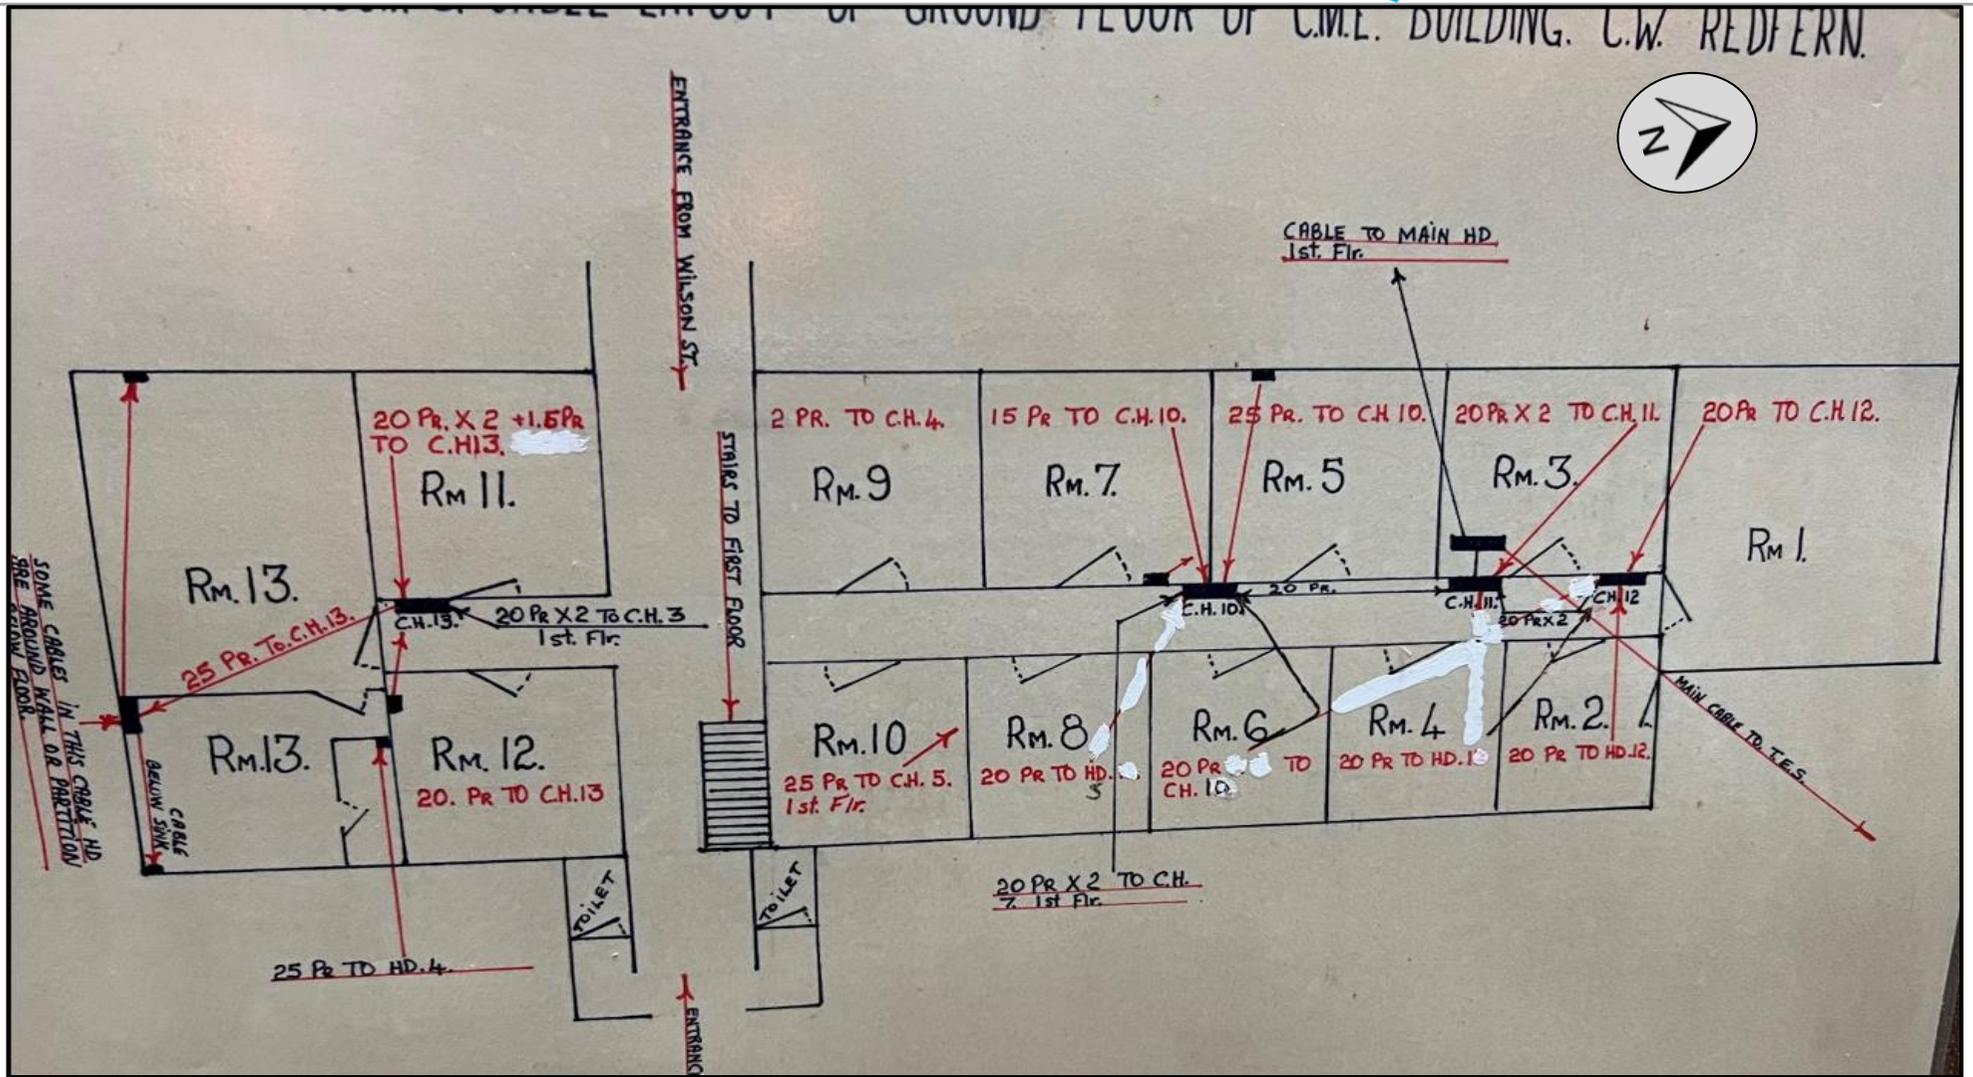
Ground floor site plan at 505 Wilson Street, North Eveleigh NSW.
